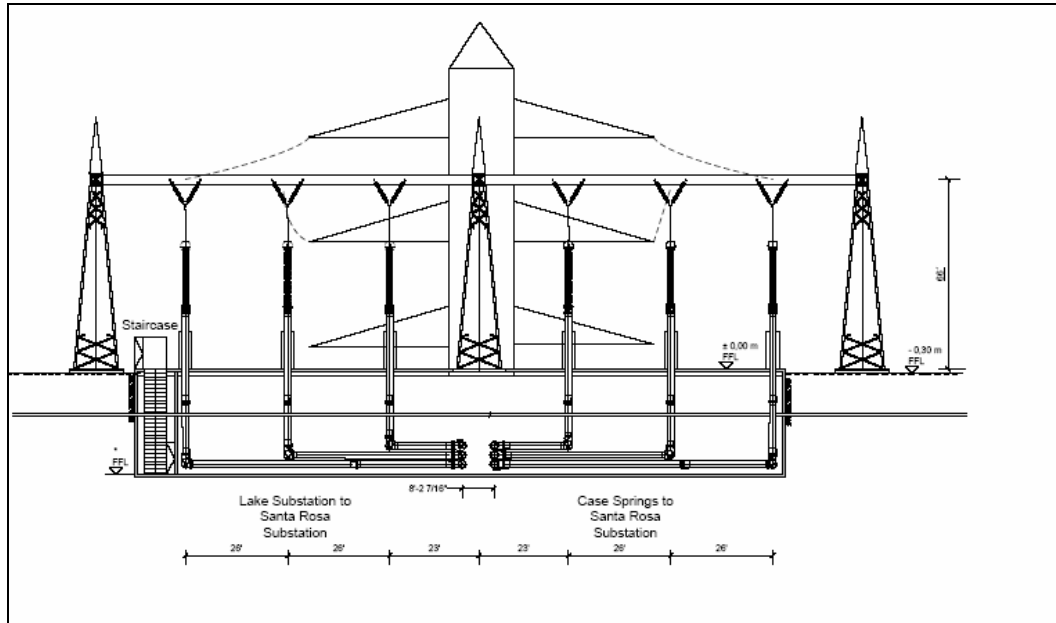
Alternative 8 Elevation (1 of 2)
